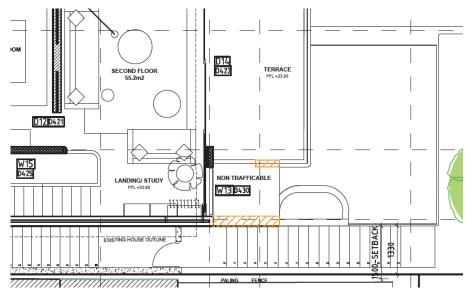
Snippet of second floor plan showing the proposed location of the external columns to be removed.
